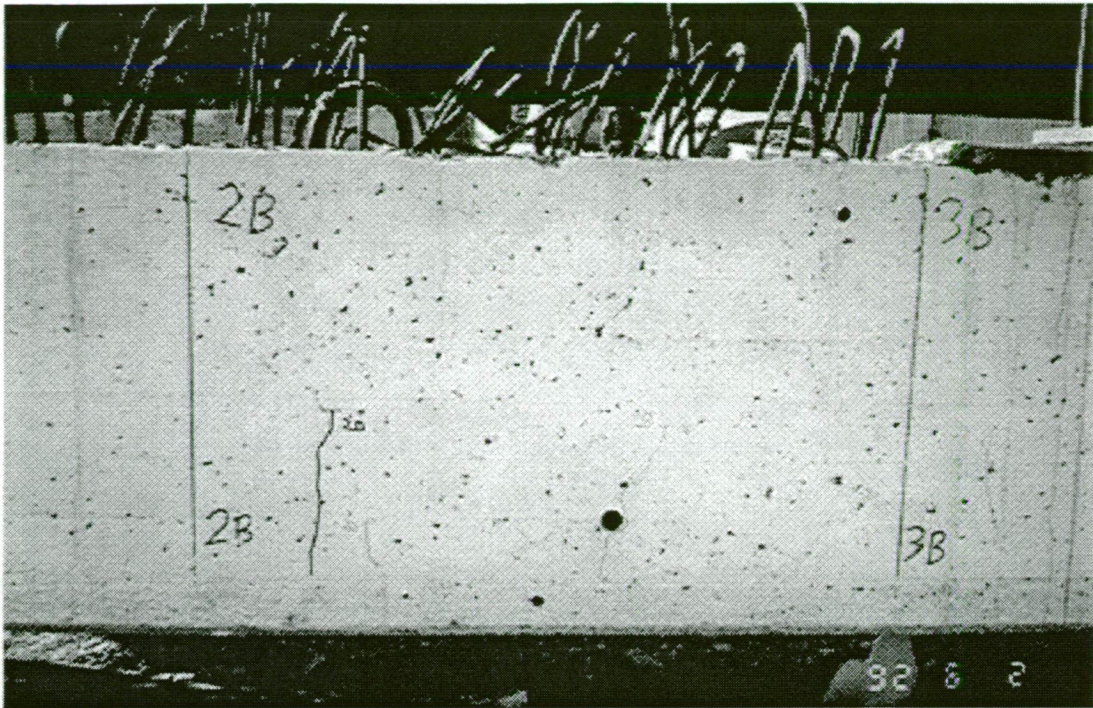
Flexural Beam Crack Patterns
